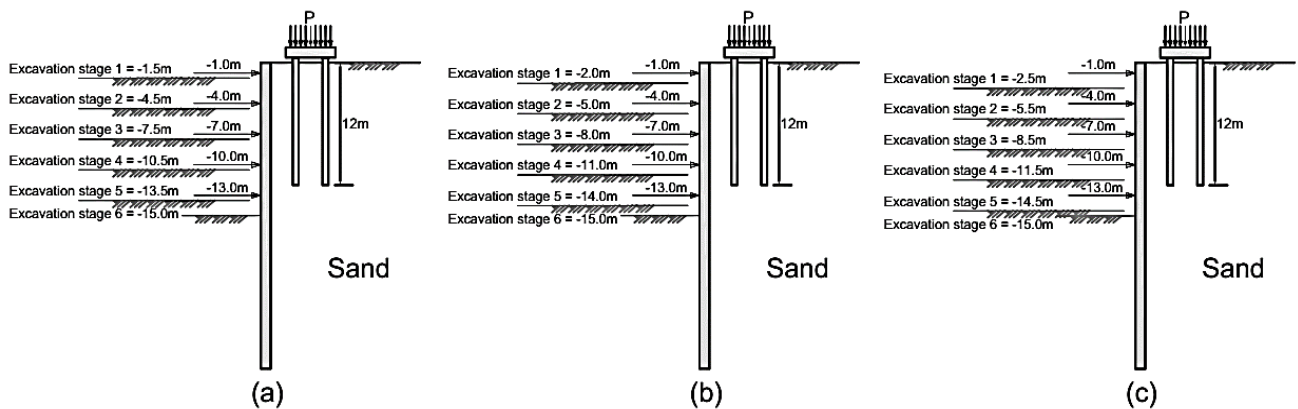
Excavation stages in cases of (a) 0.5 m, (b) 1.0 m, and (c) 1.5 m distance between the strut and the excavation surface
